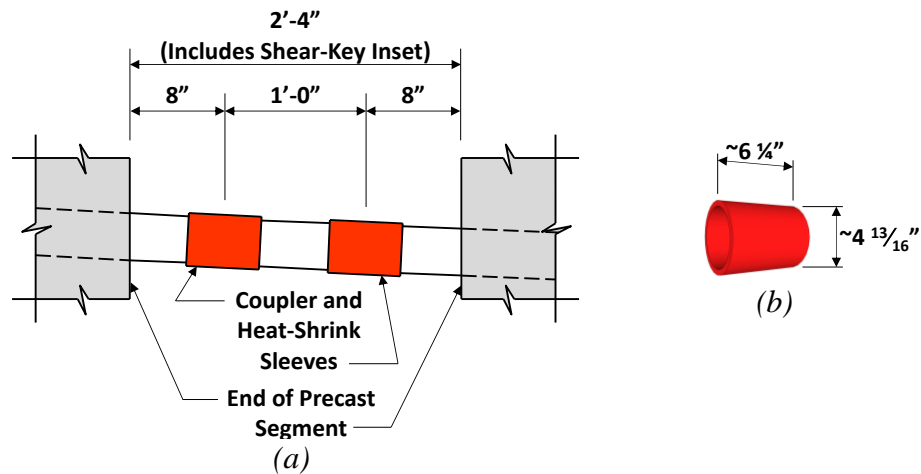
Duct coupling – (a) construction detail; (b) coupler dimensions
